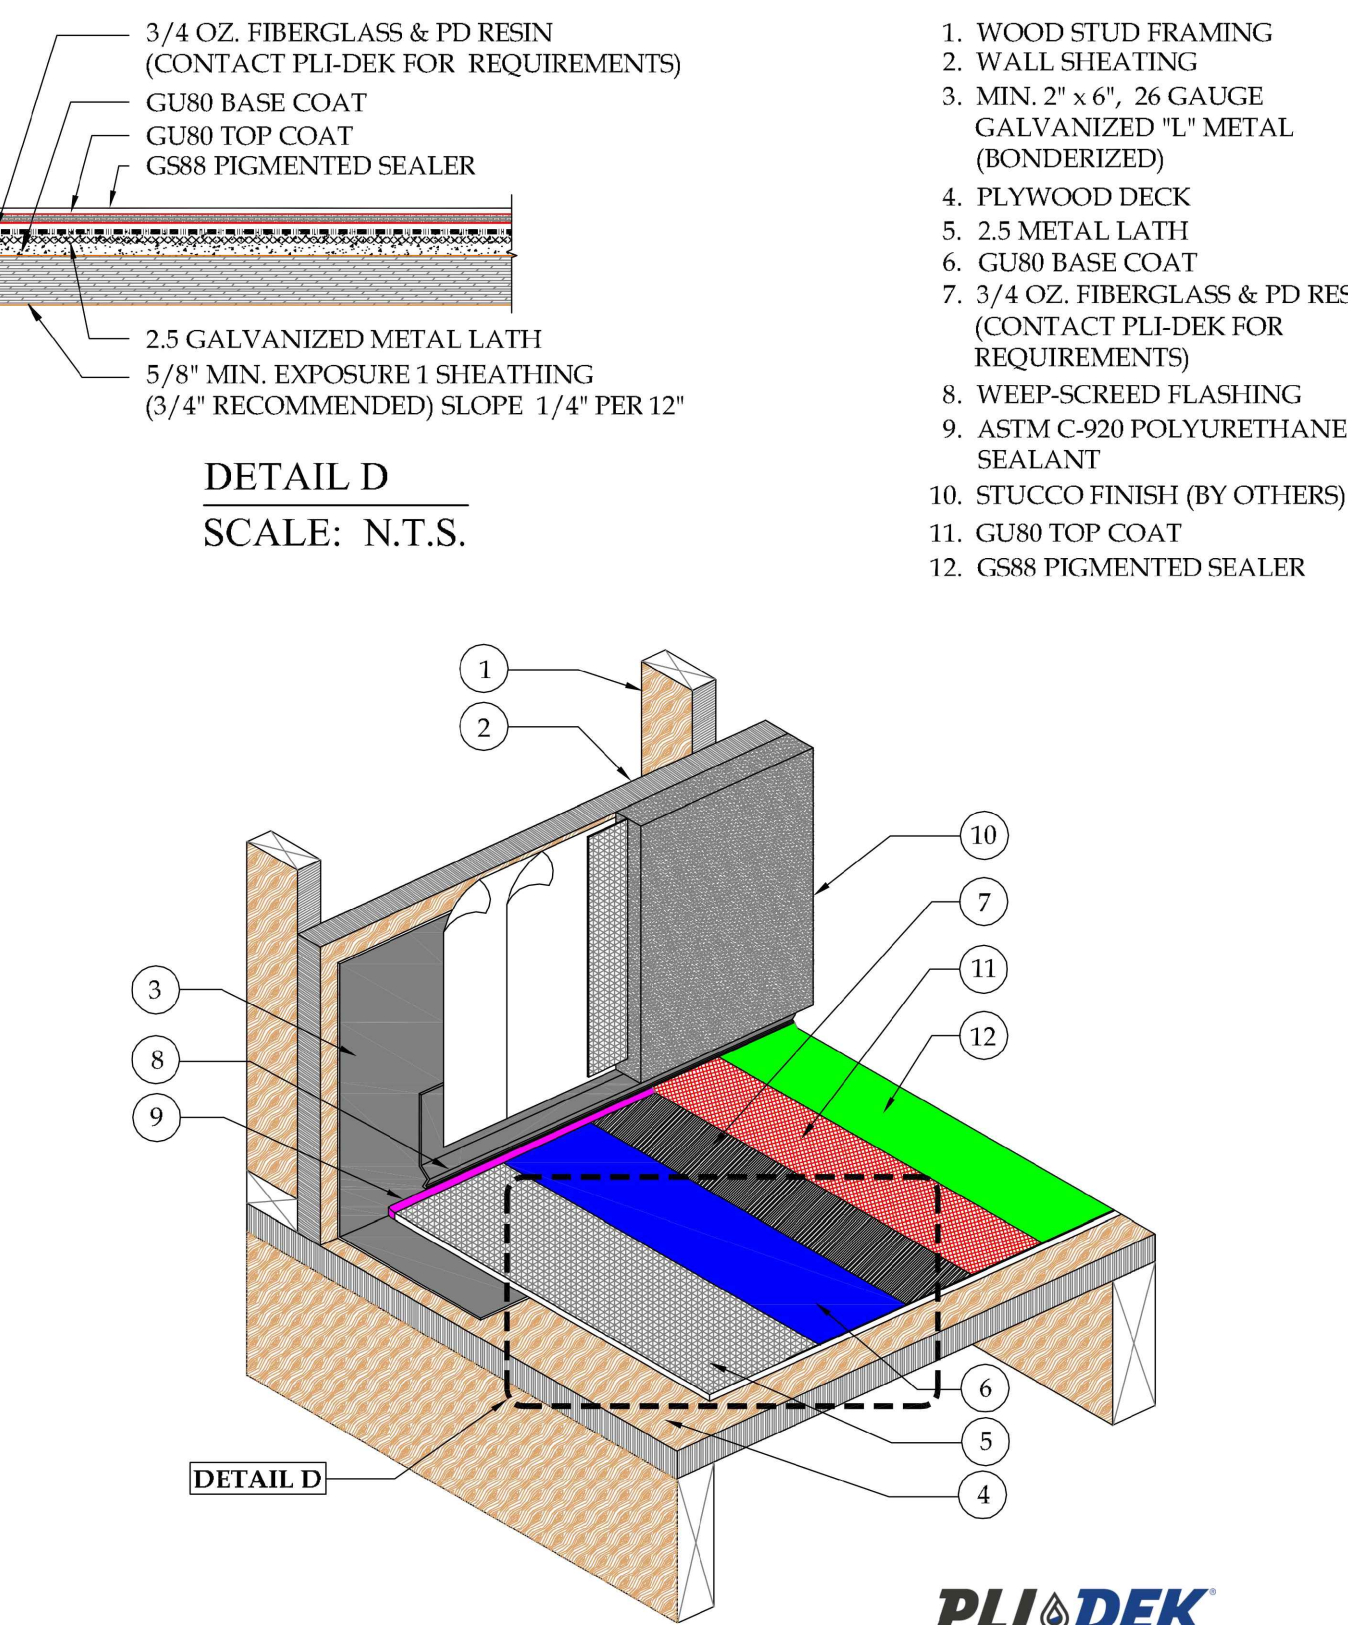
DETAIL-PLI-DEK SYSTEM - DECK PLAN VIEW
